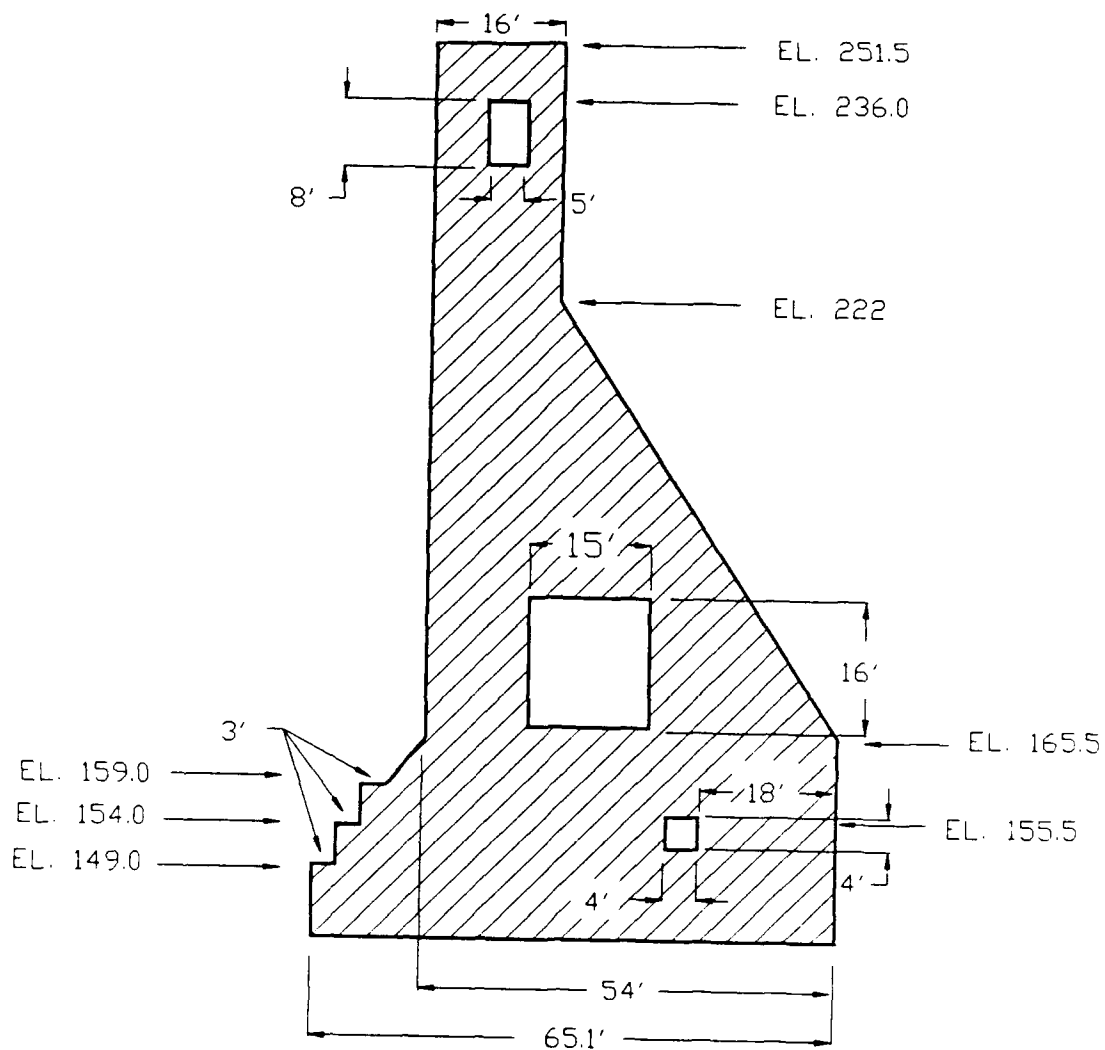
Basic elevations and dimensions for the model of north chamber wall monoliths at Eisenhower Lock
